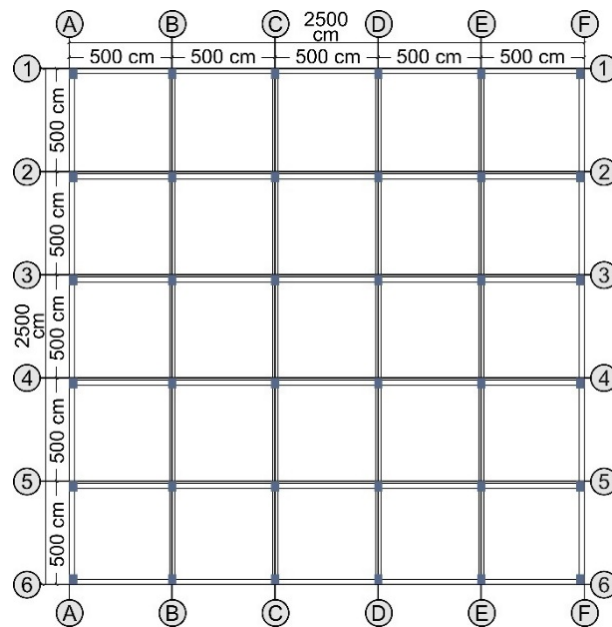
Blueprint of the sample reinforced concrete (RC) building.
